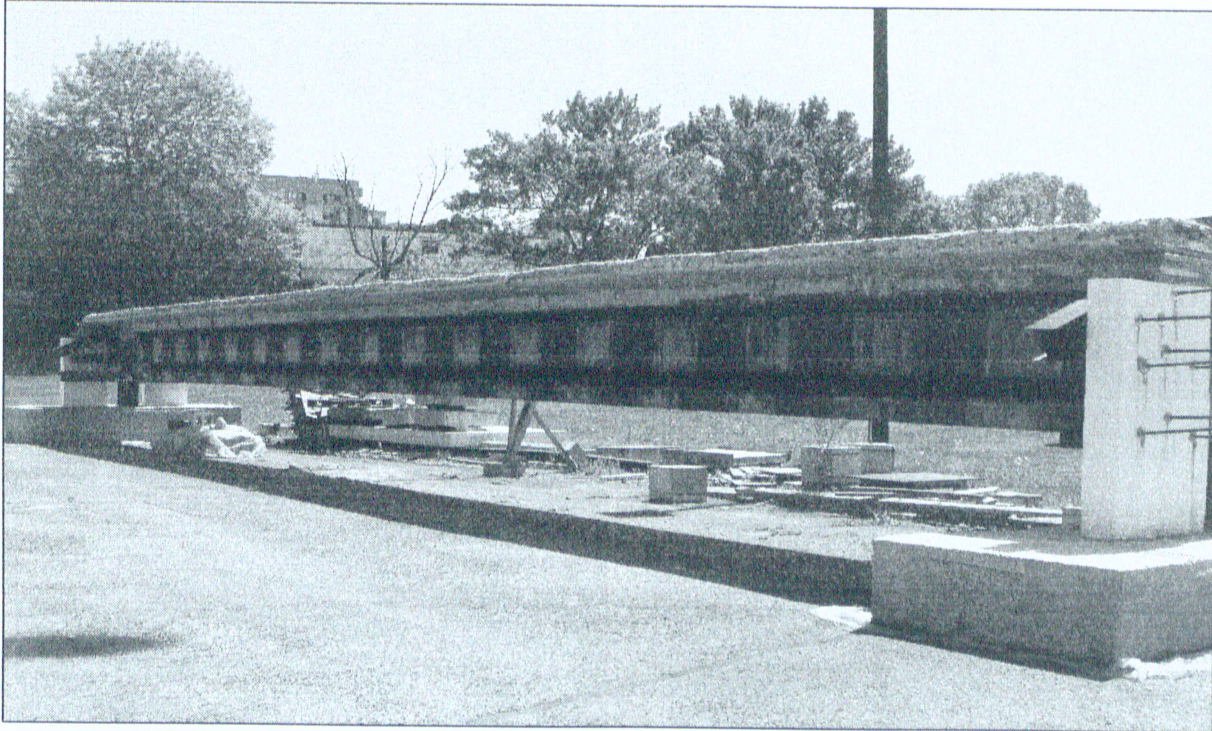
Full view of fully completed, CFRP strengthened girder
